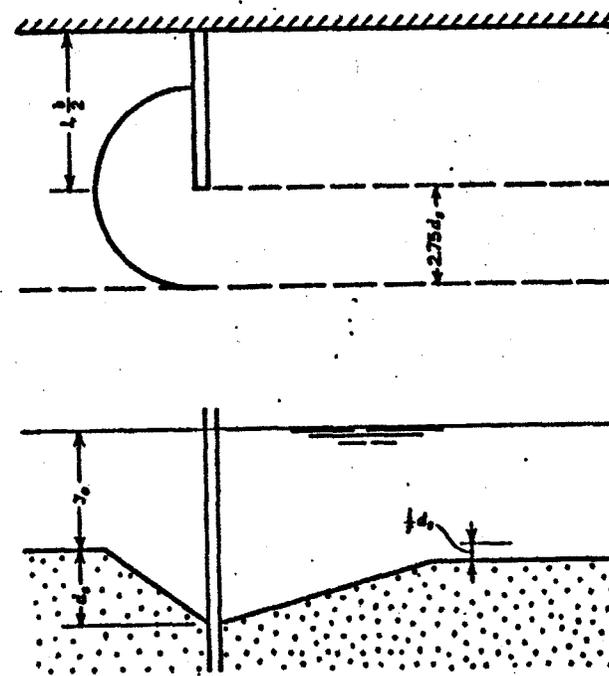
DEFINITION SKETCH FOR PIER AND ABUTMENT
